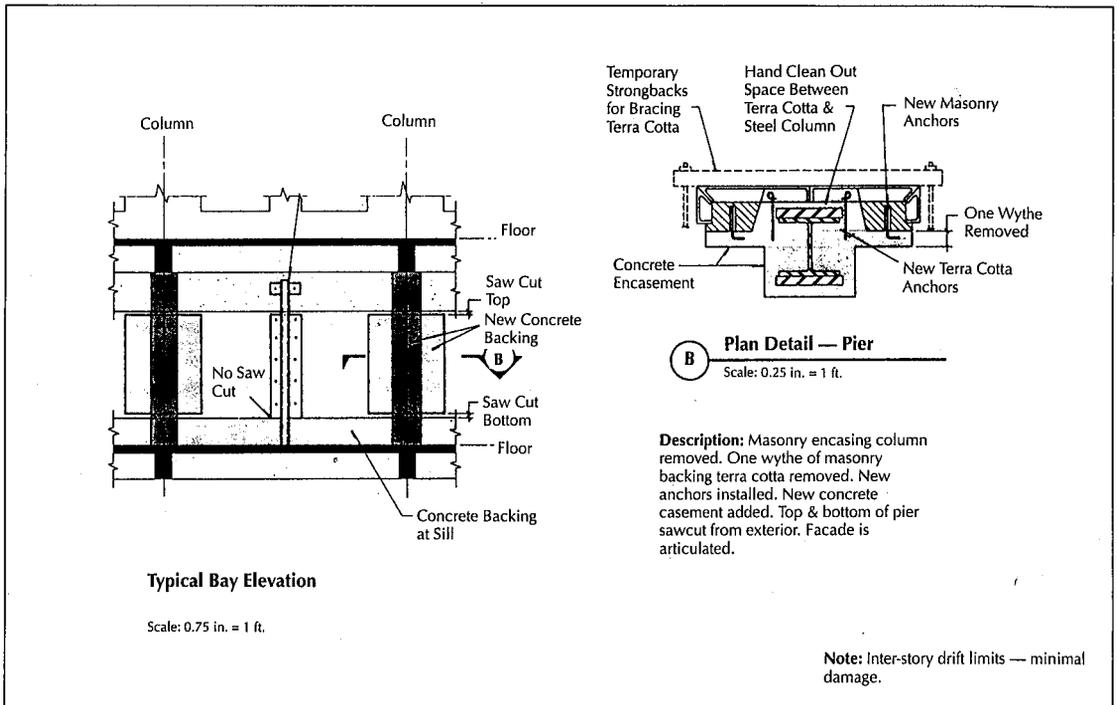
Articulated facade details for the PG&E Market Street complex.
